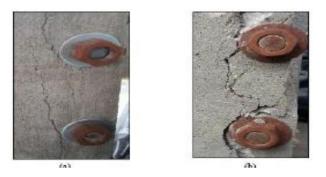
(a) Small cracks on the surface of FRLFC (b) Wide cracks on the control specimen
